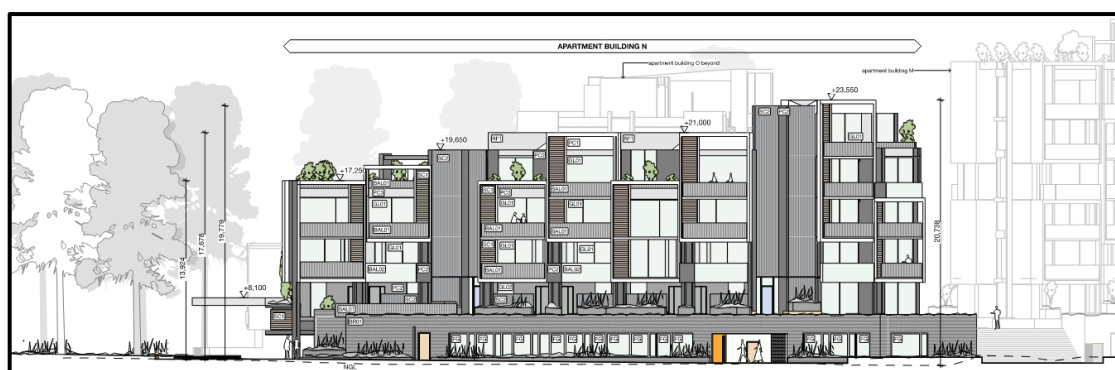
The western elevation of Building N looking from the gardens in front of the existing school building. The built form decreases in height on the northern end of the building where it is adjacent to the Cadbury Road frontage.
